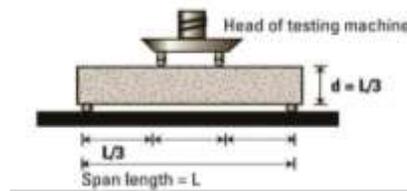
Two point loading test(Source: <https://civilblog.org/2015/06/24/flexural-strength-test-of-concrete-is516-1959>)
